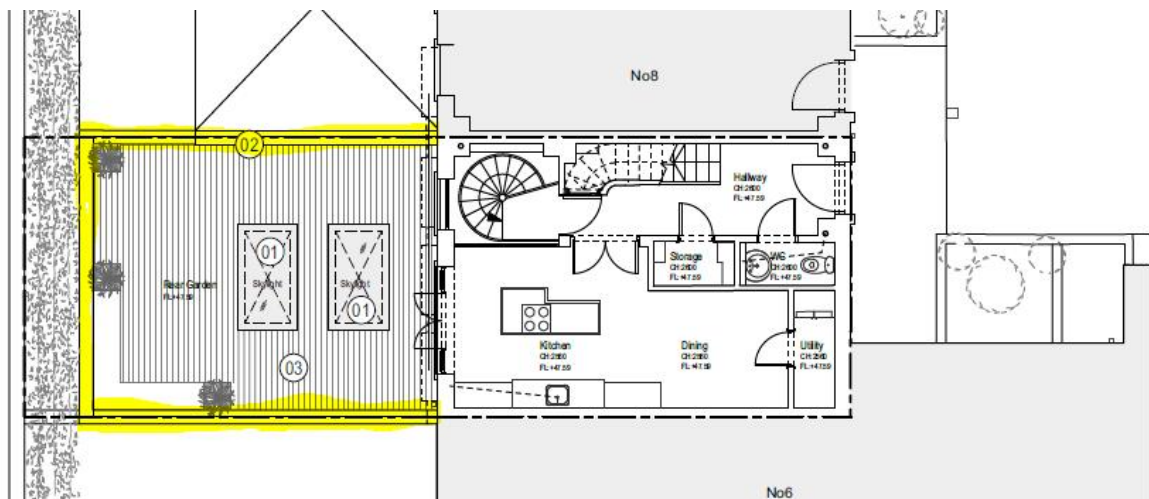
PROPOSED GROUND FLOOR (BASEMENT BELOW HIGHLIGHTED)
